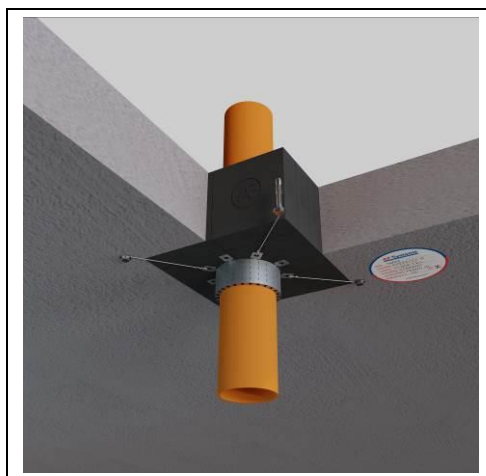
Examples of plastic pipe passing through AF BRICK seal in floors.
